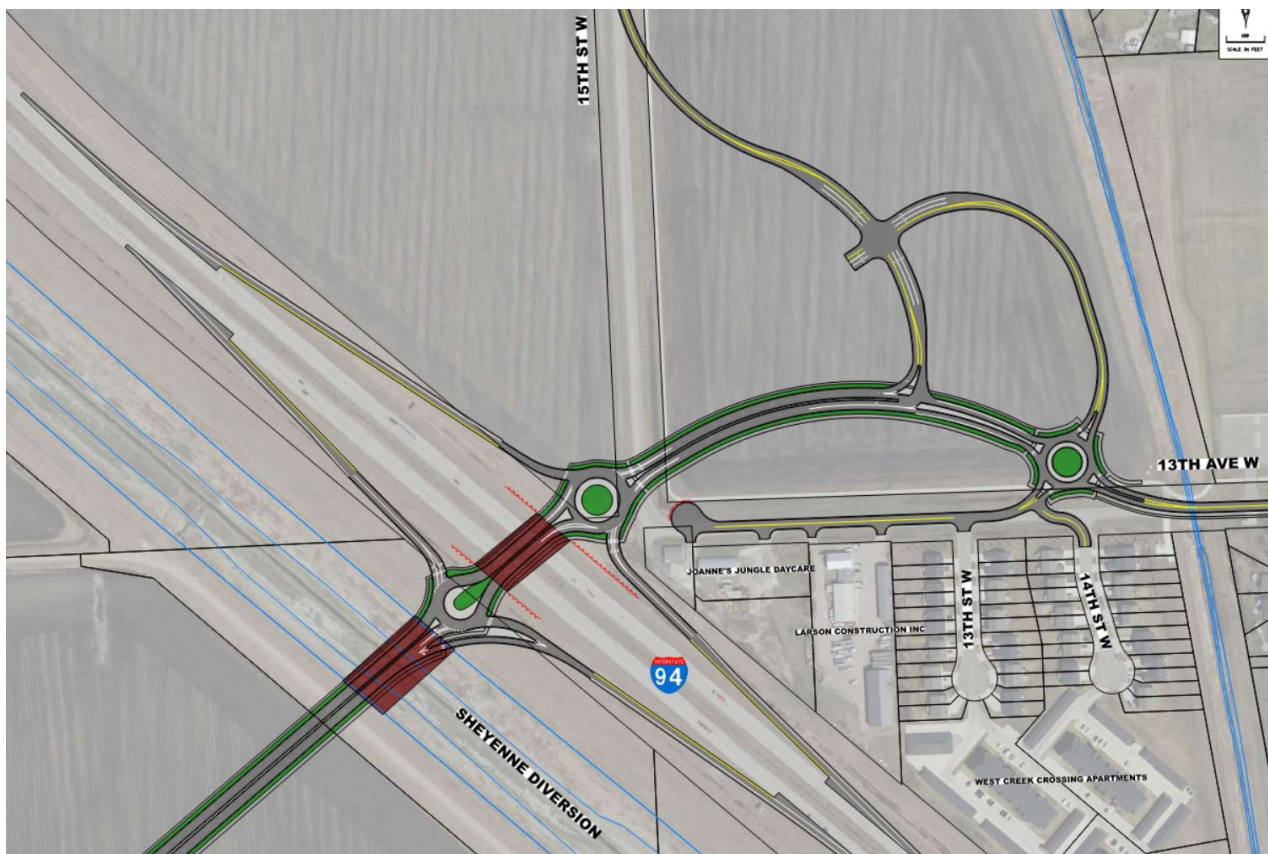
Roundabout Interchange – 4-Legged North Ramp Intersection
